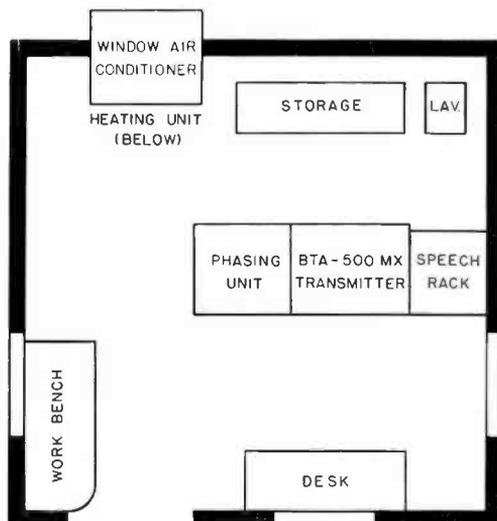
Layout of KBKC transmitter building showing all facilities required for remote operation.
